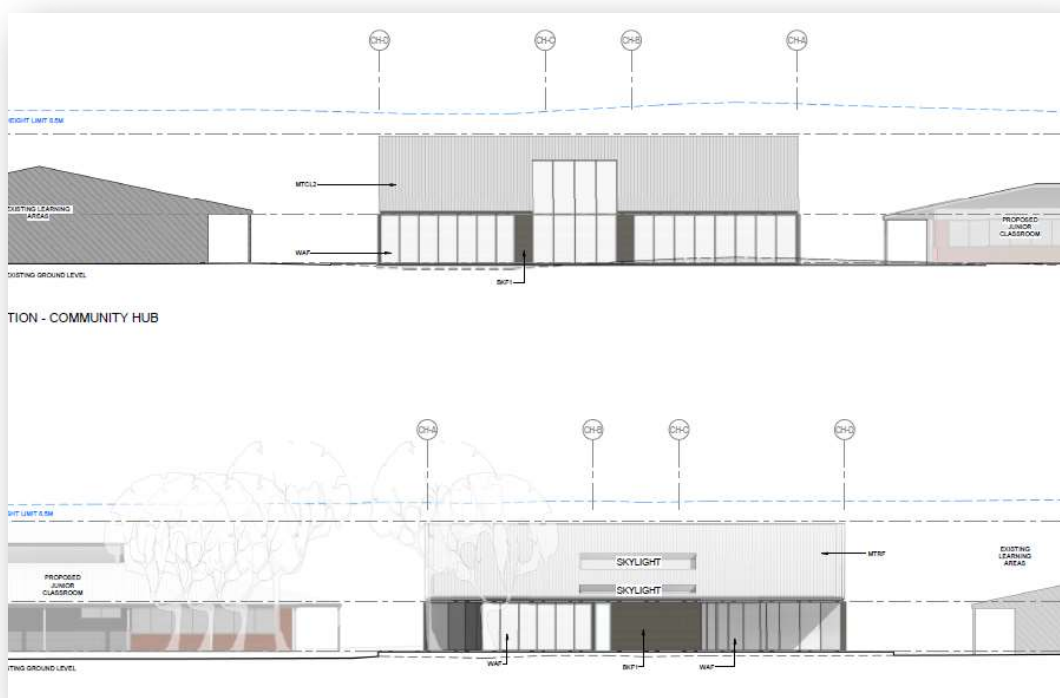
Extract from Elevations Plan (Drawing DA-CH-30-02) showing the east and west elevations of the Community Hub building Centre (Source: Cox Architecture 2022)
